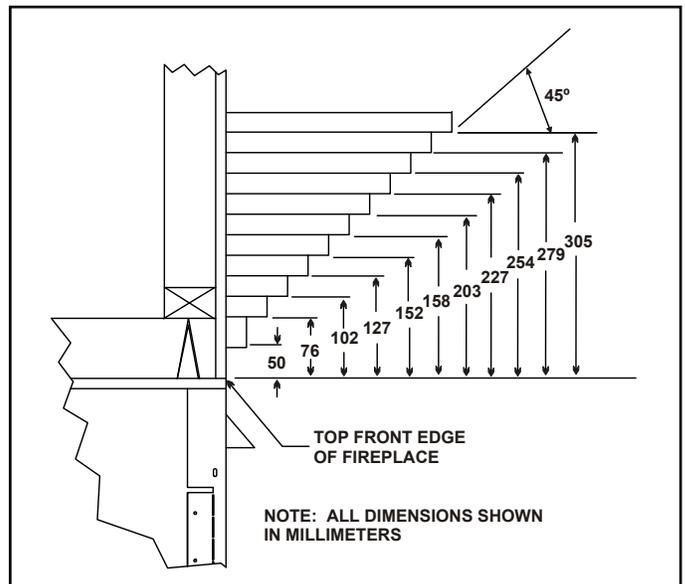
Minimum Vertical and Maximum Horizontal Dimensions of Combustibles above Fireplace
